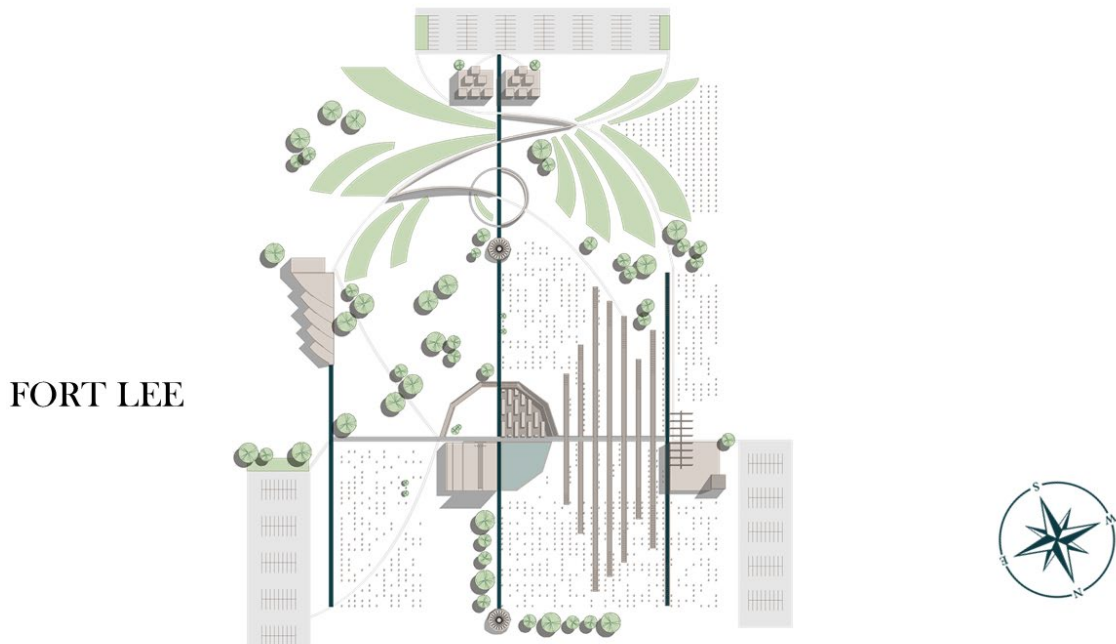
Fort Lee Cemetery Site Plan
